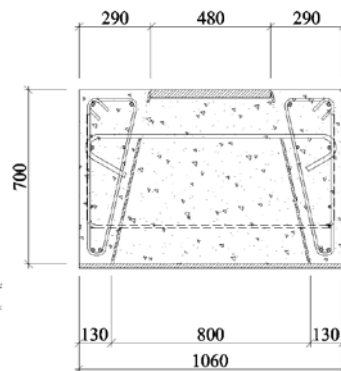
COMPOSITE BEAM CROSS-SECTION
